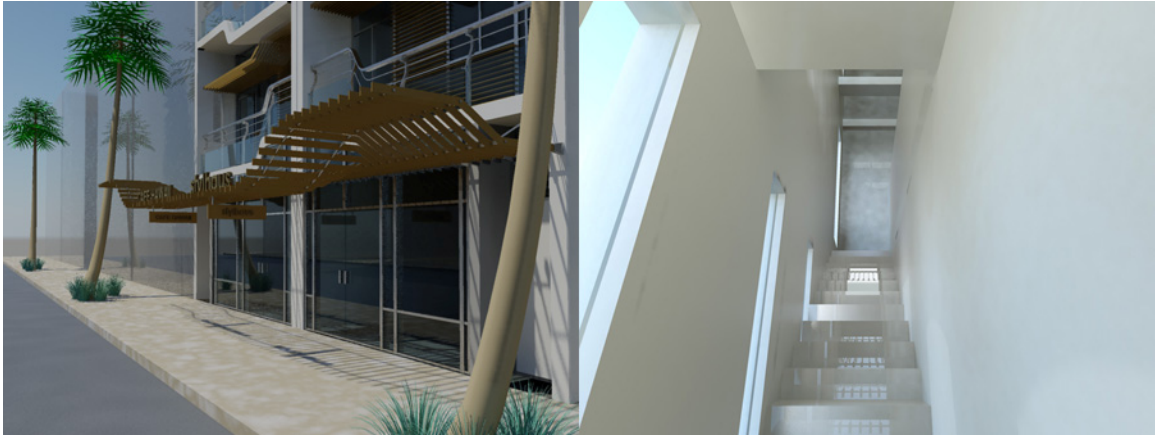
Perspective Rendering of Storefront Façade (left) and Residential Entry Staircase (right)
